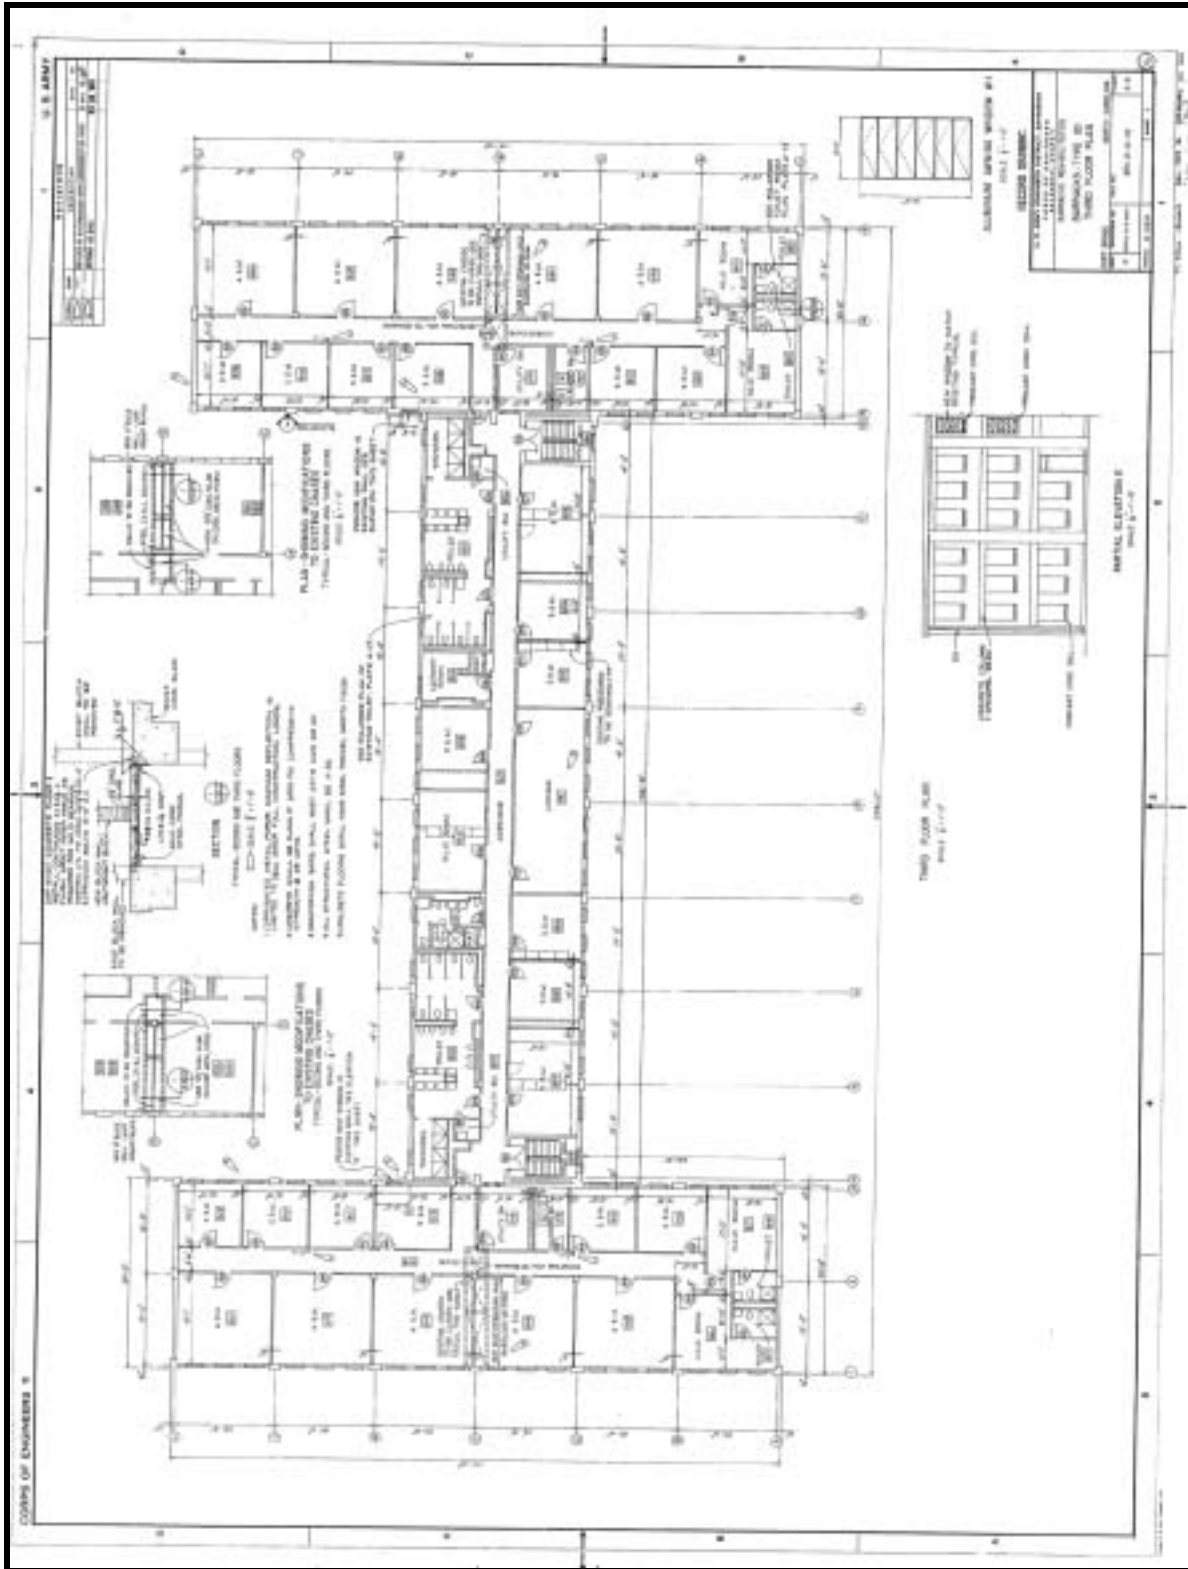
Renovated H- style, two-company barracks, barracks wing, third floor plan, Ft. Bragg (1972, revised 1974) (Engineering, Ft. Bragg).
